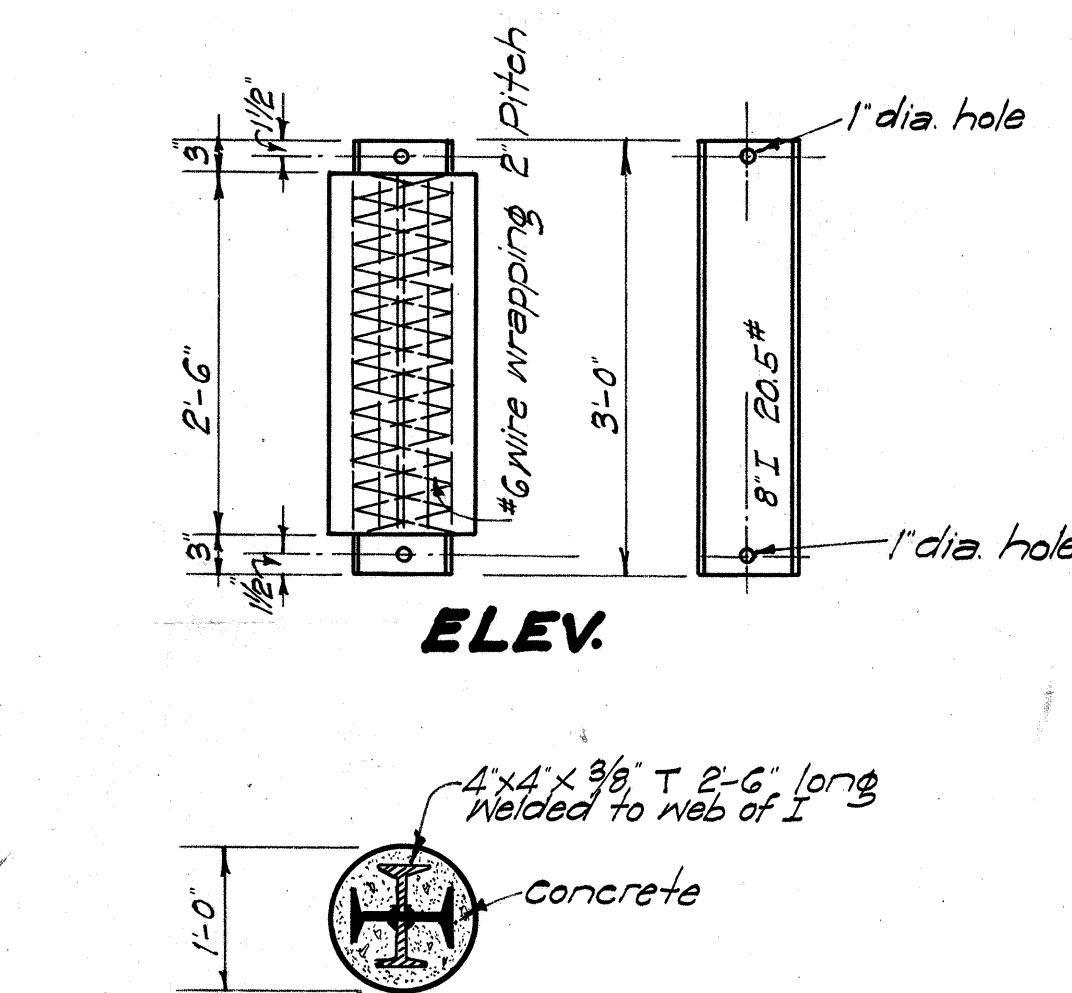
DETAIL OF NORMAL ANCHOR TIE AT ABUTMENT
